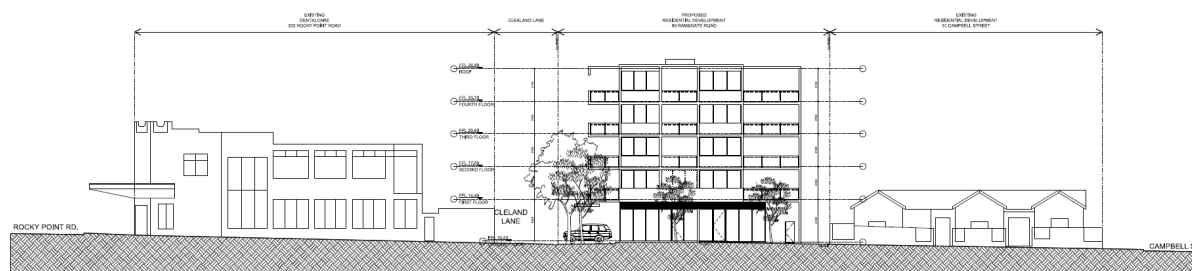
Streetscape Elevation (South elevation, Ramsgate Road).
